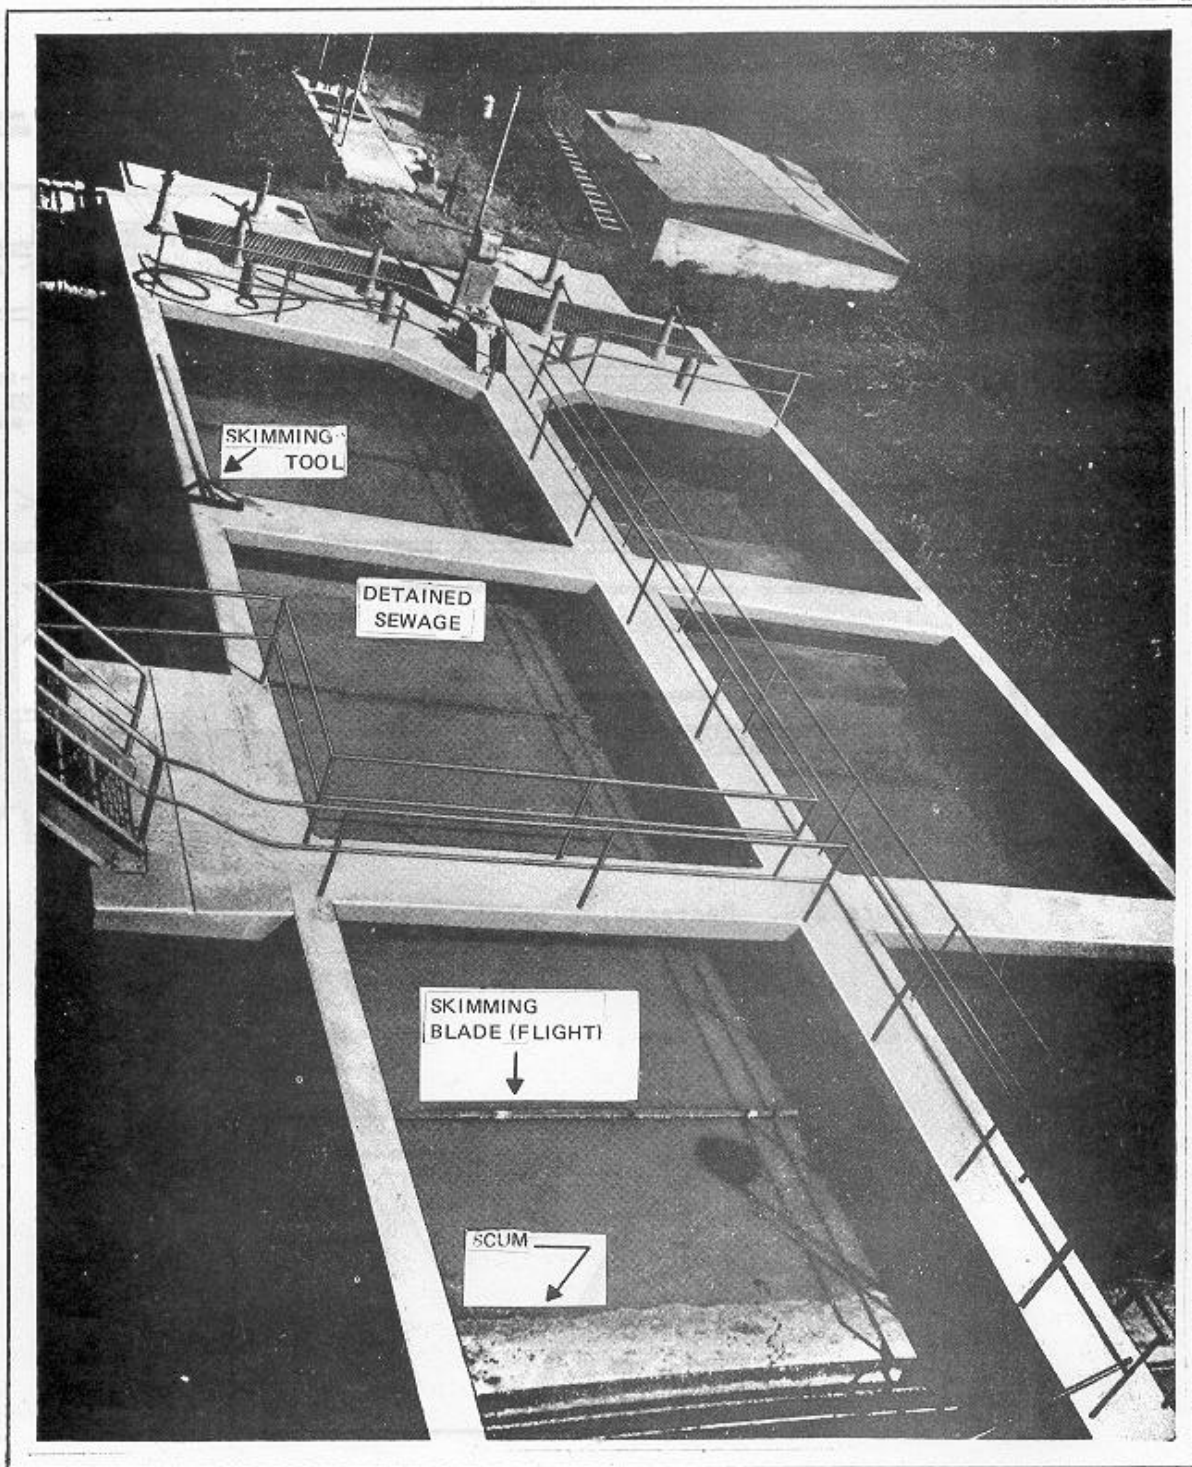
Rectangular primary settling tanks with powered skimming equipment.
